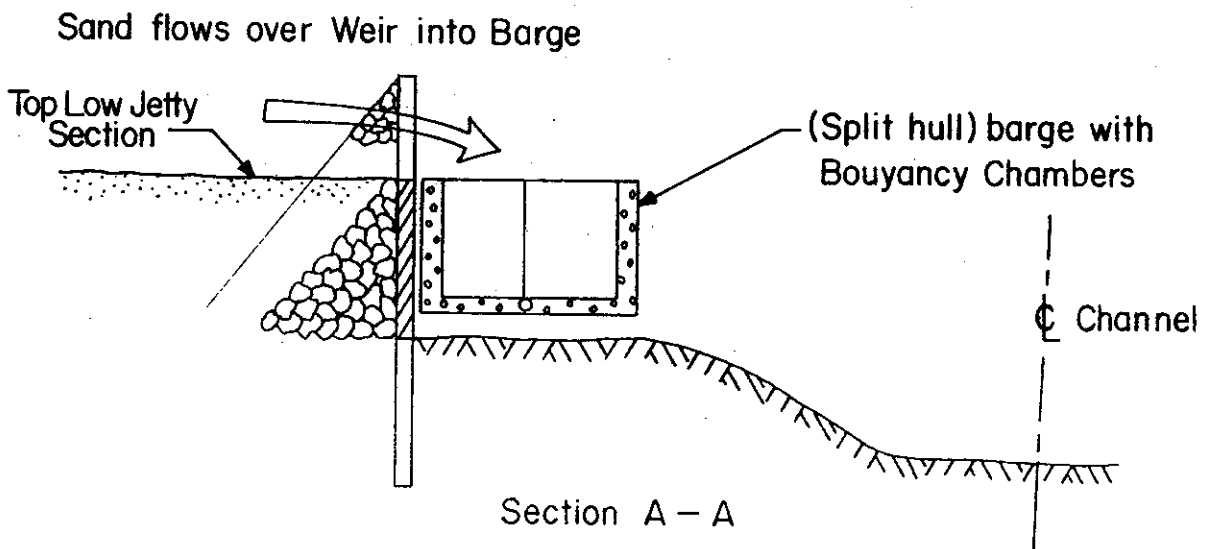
SCHEMATIC WEIR JETTY – HOPPER BARGE SAND BYPASSING SYSTEM
